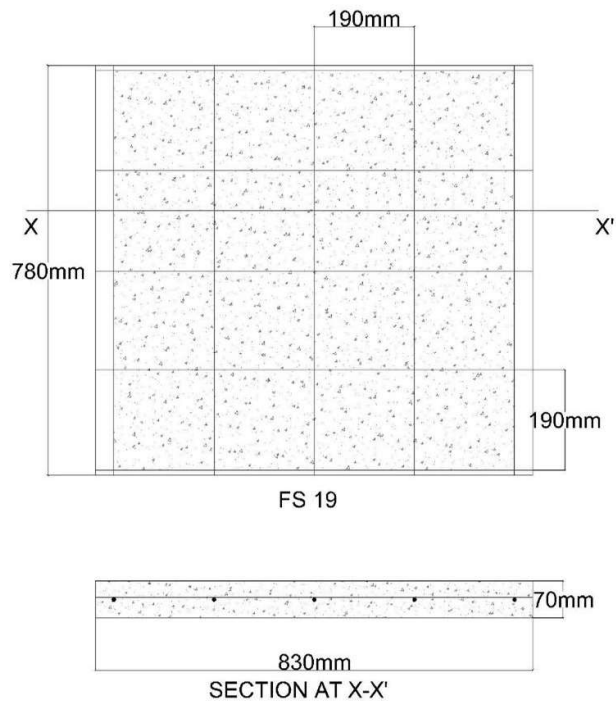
Reinforcement Details of 190 mm spacing specimen
